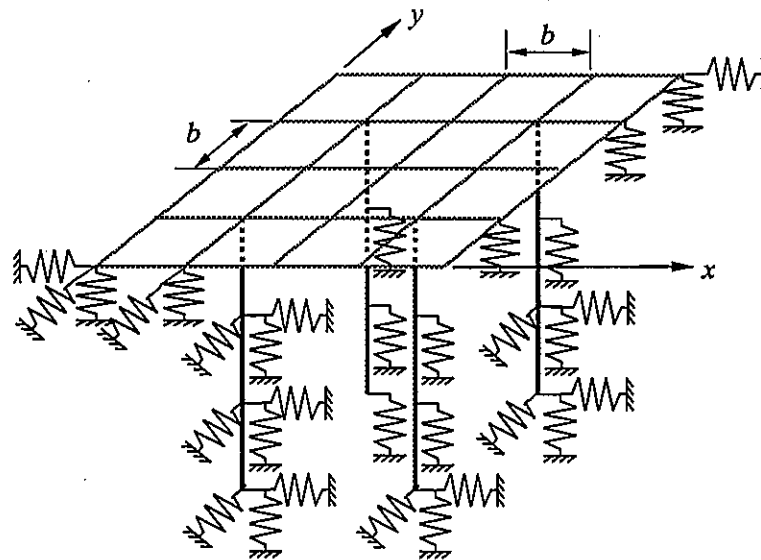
Plate-beam-spring modelling of a piled raft foundation.
